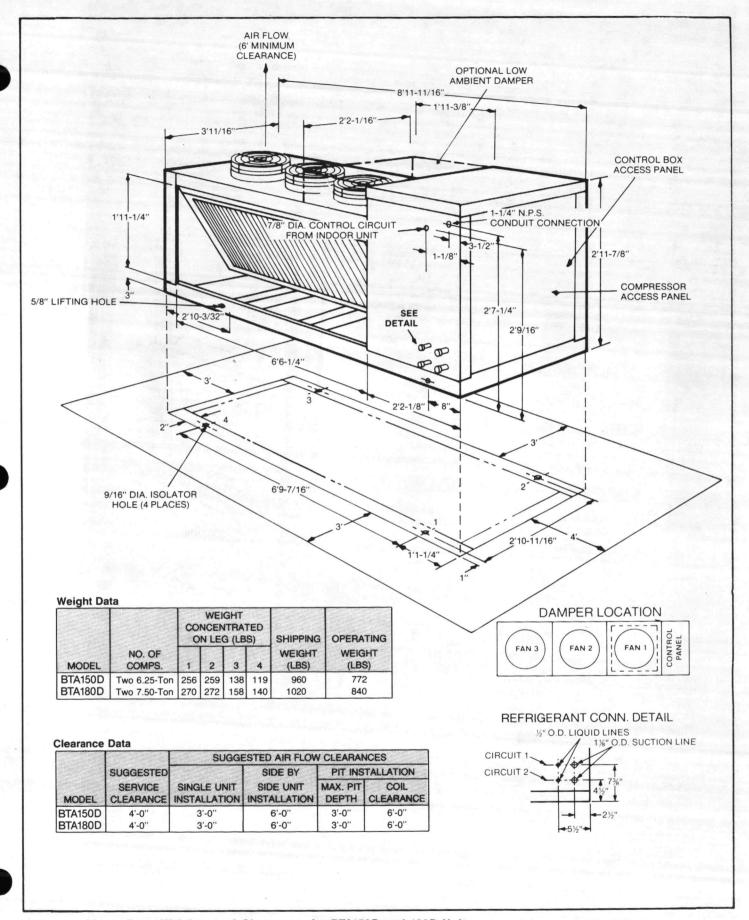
Dimensions, Weights, and Clearances for BTA150D and 180D Units
